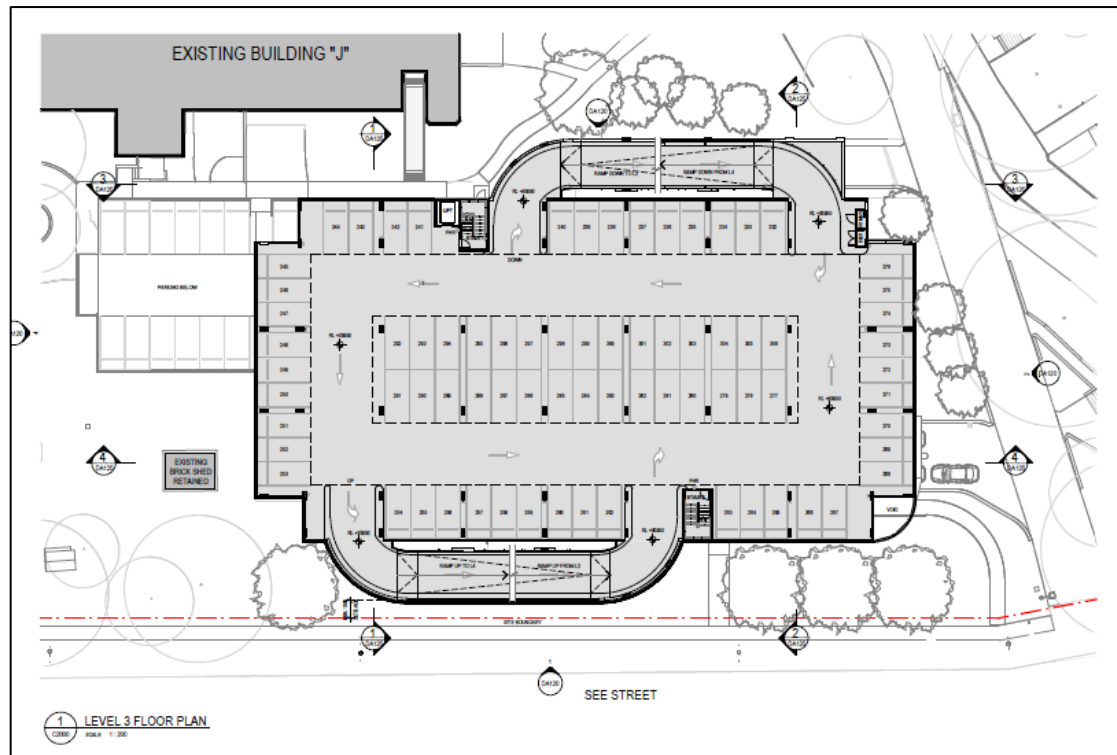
Level 3 floor plan of proposed multistorey carpark (Source: Hansen Yuncken, 2021b: DA103, Revision A).
